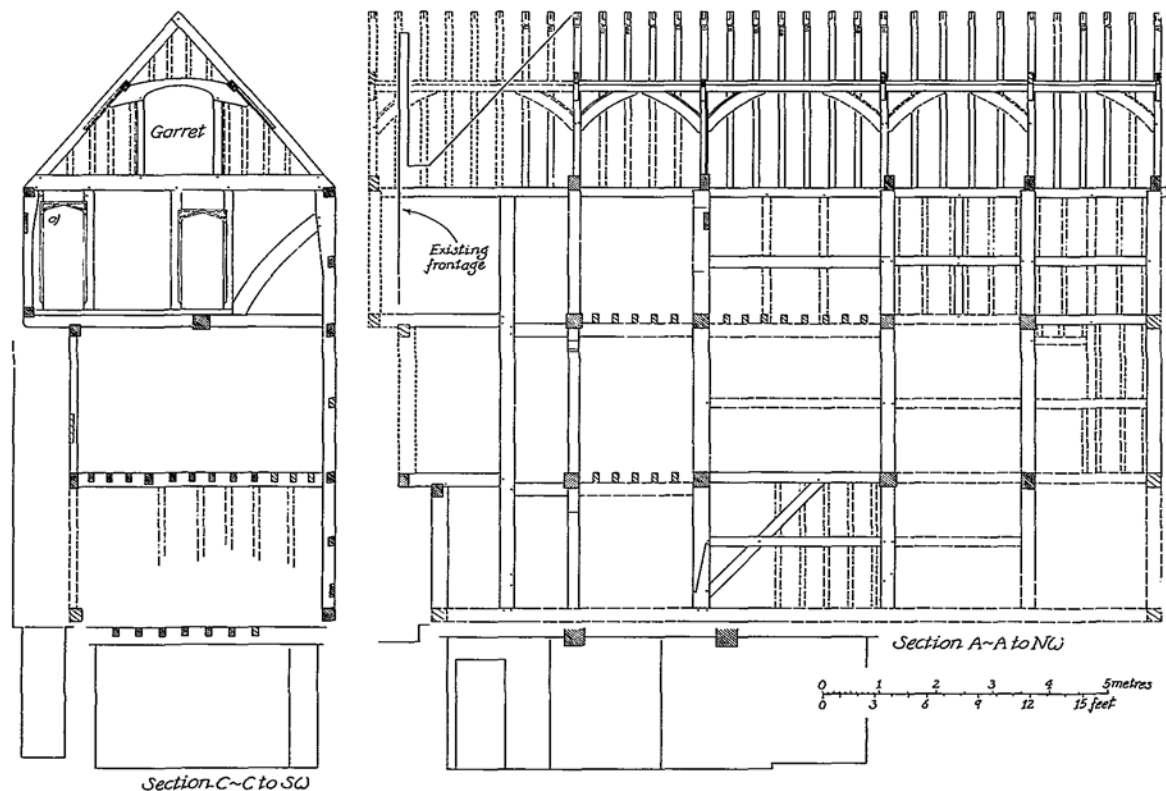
No. 3 The Parade, Canterbury: Longitudinal and cross-sections through the building.
